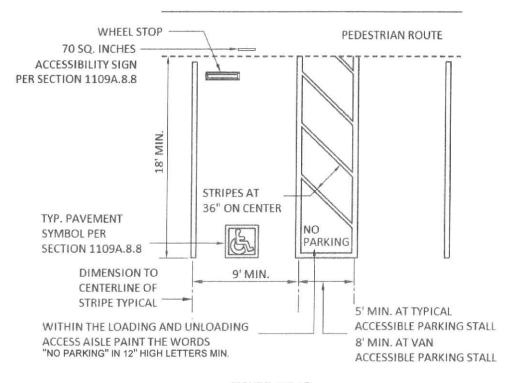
A-2B SINGLE AND VAN ACCESSIBLE PARKING STALLS
